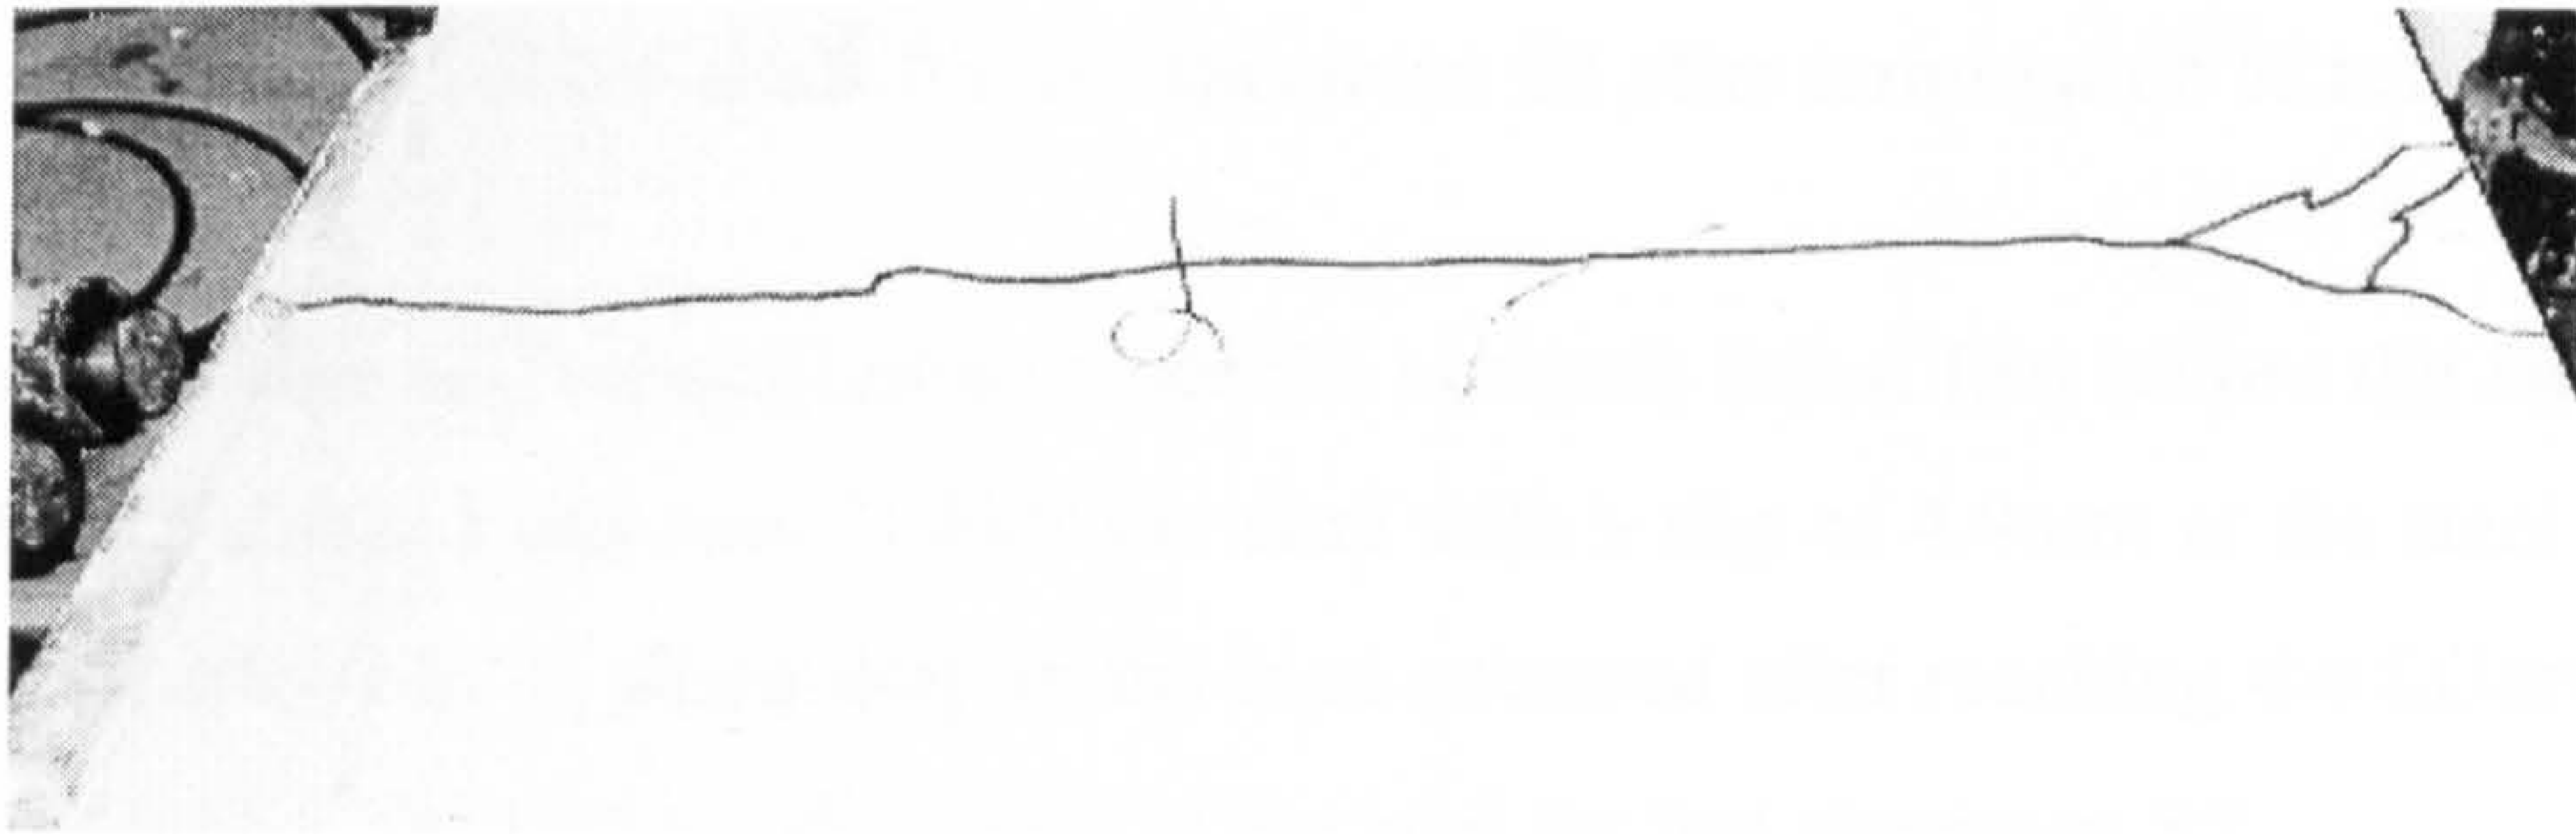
Cracks at middle upper surface of concrete slab for test specimen S2
